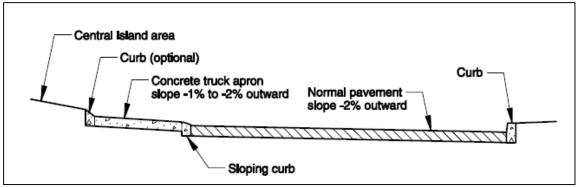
Mountable Concrete Truck Apron (NCHRP, 2010)
